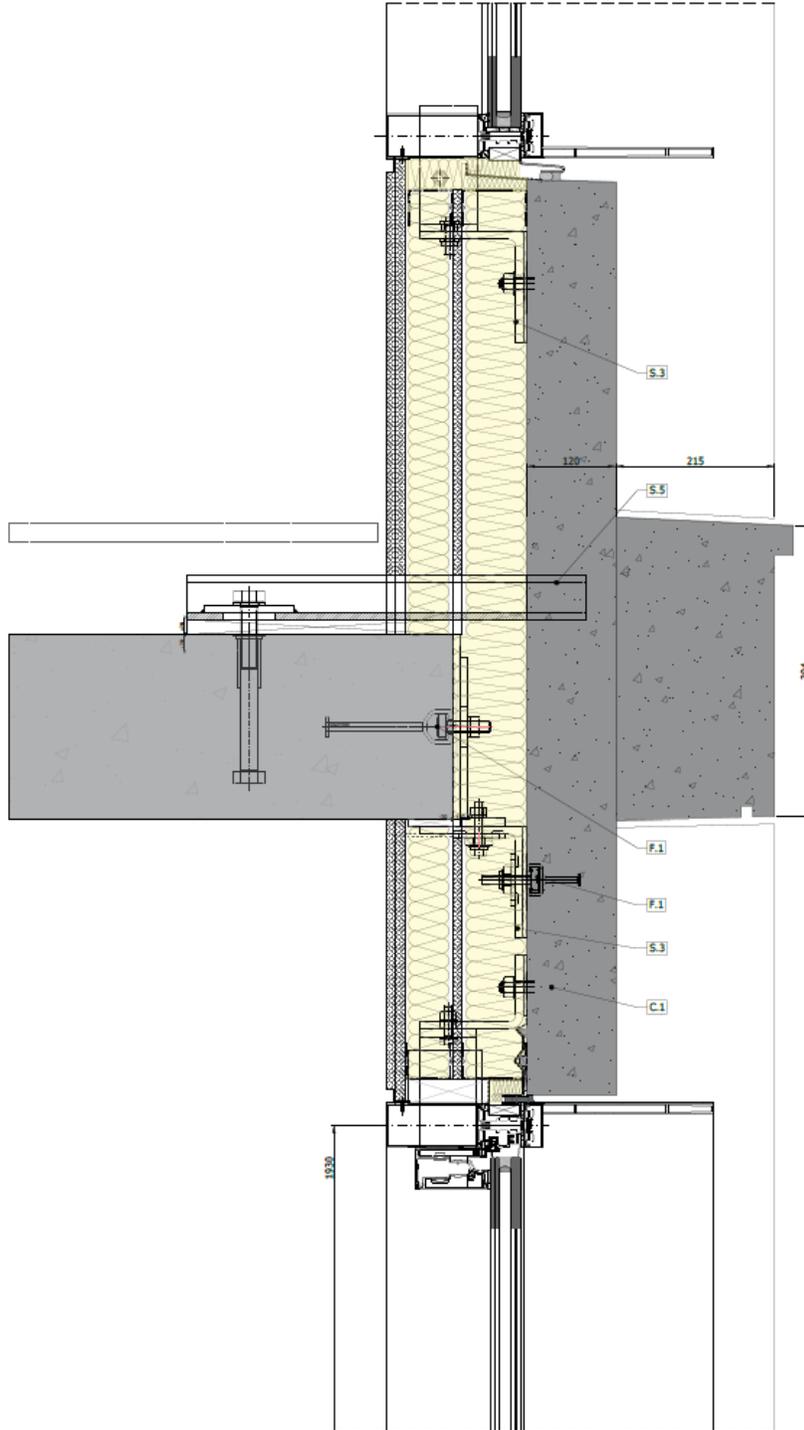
East Elevation WT-1C façade module typical- Prefeb- section Detail 1. Source: Author
